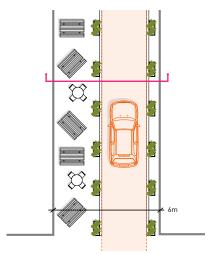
Design Idea 1; Enlarged Plan, plan
